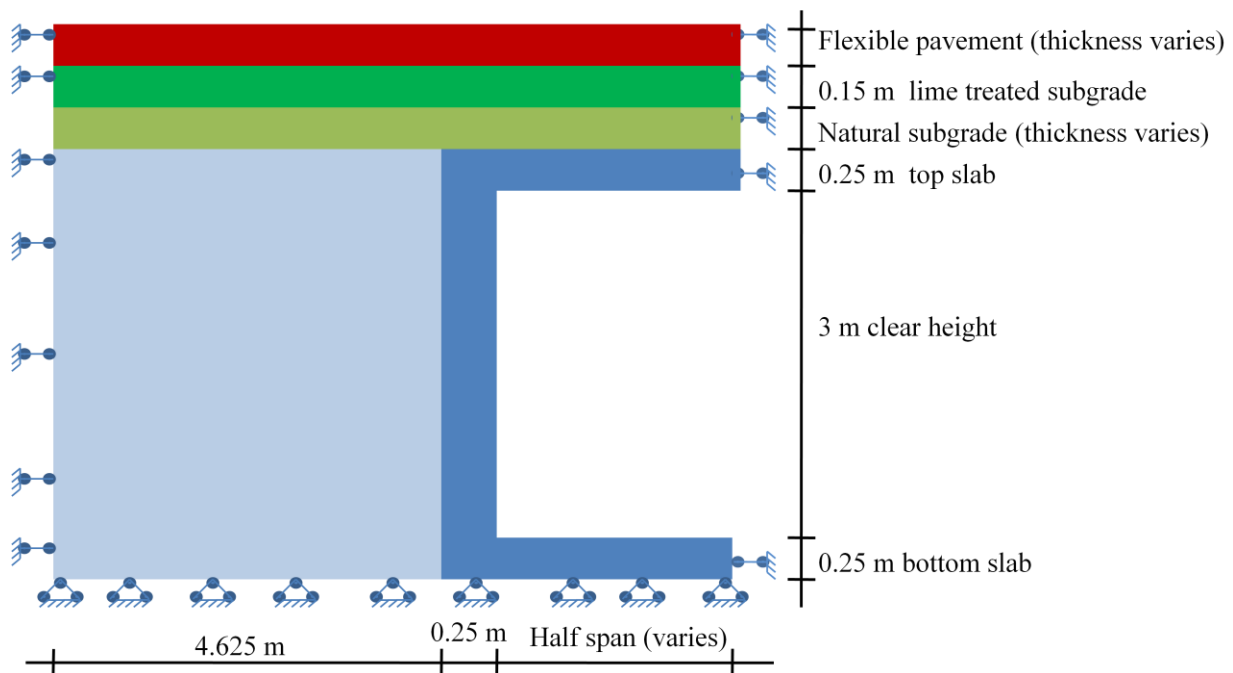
and 5.3 show the typical cross sections of the culvert models under rigid and flexible pavements respectively. Similar to the culvert model under the rigid pavement used for the verification, the culvert models with rigid pavements for the parametric study also consisted of a top concrete layer, a cement-treated base layer, a lime-treated subgrade layer, and a natural subgrade layer. The thicknesses of the cement-treated base layer and the lime-treated subgrade layer were fixed at 100 mm and 150 mm respectively for all the models. However, the flexible pavement consisted of a hot mix asphalt layer, a lime-stabilized subgrade layer, and a natural subgrade layer, in which the lime-treated subgrade was 150 mm thick. The thicknesses of the concrete layer, the asphalt layer, and the natural subgrade layer were varied during the parametric study. All the box culverts modeled had 250 mm thick walls and top and bottom slabs. The clear height of each culvert was fixed at 3 m. The span of the culvert was one of the variables for the parametric study. The width of the backfill beyond the culvert was fixed at 4.625 m for all the culverts analyzed in this study, which is far enough to avoid the boundary effect. Figures 5.4 and 5.5 show two typical numerical models for the culverts under rigid and flexible pavements respectively. Finer zones were used near the culvert and the zone density gradually decreased away from the culvert.
